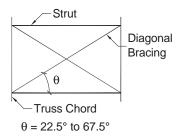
Horizontal X-Bracing Arrangement
